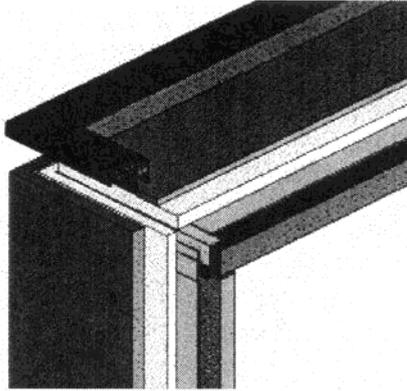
Joint air barrier design units (with all other layers). Note the two parts of the air barrier: the portion overlapping the steel plate is allocated as a rubber membrane while the portion solely on the slab itself is actually allocated by the slab surface.
